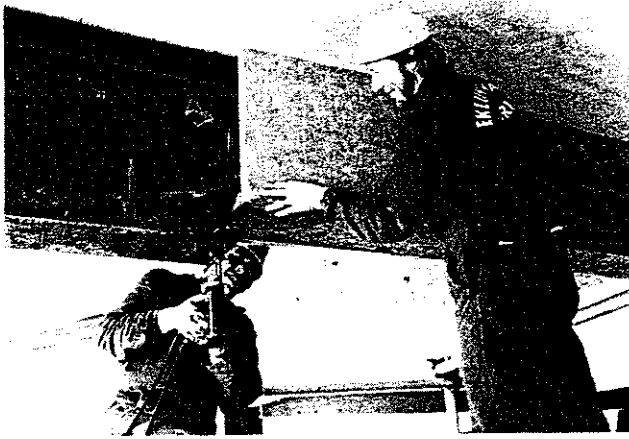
a. Fire insulation of steel girders with slabs of mineral wool
